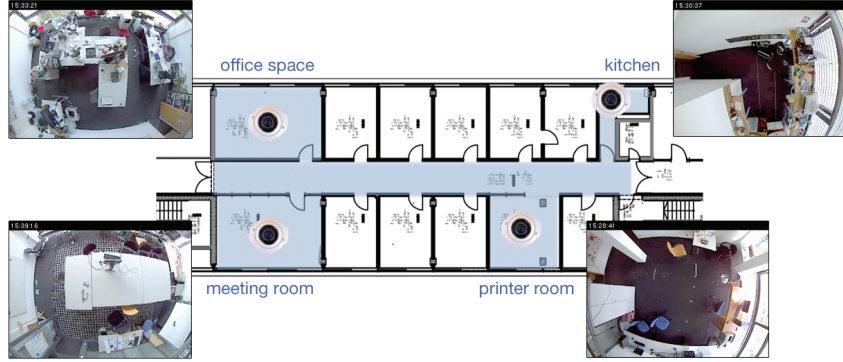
Floor Plan: Position of ceiling mounted fish-eye cameras.
